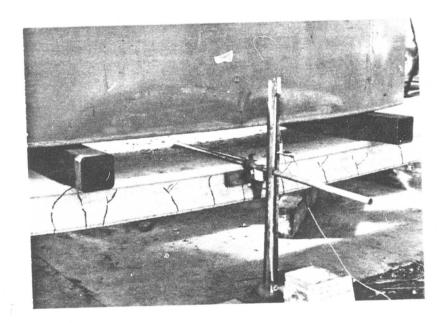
Test No. 1, Partial Slab Failure After Final Drop - No Collapse.
